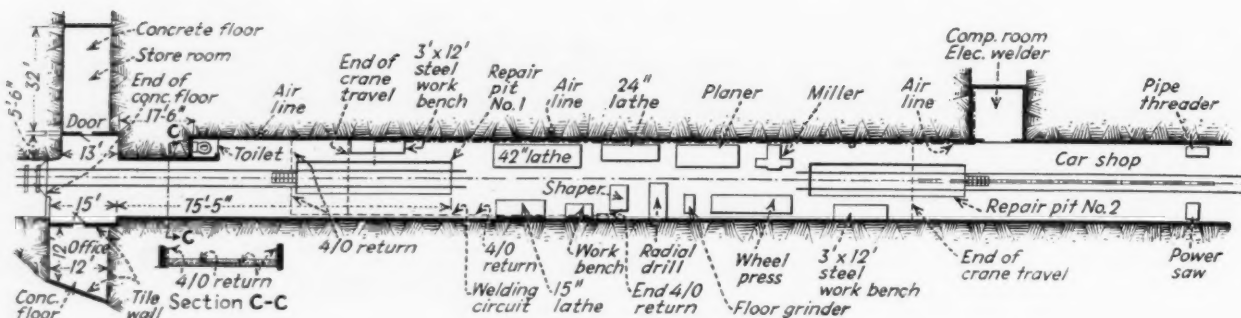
Plan view of Isabella underground shop and auxiliary office and storeroom.
